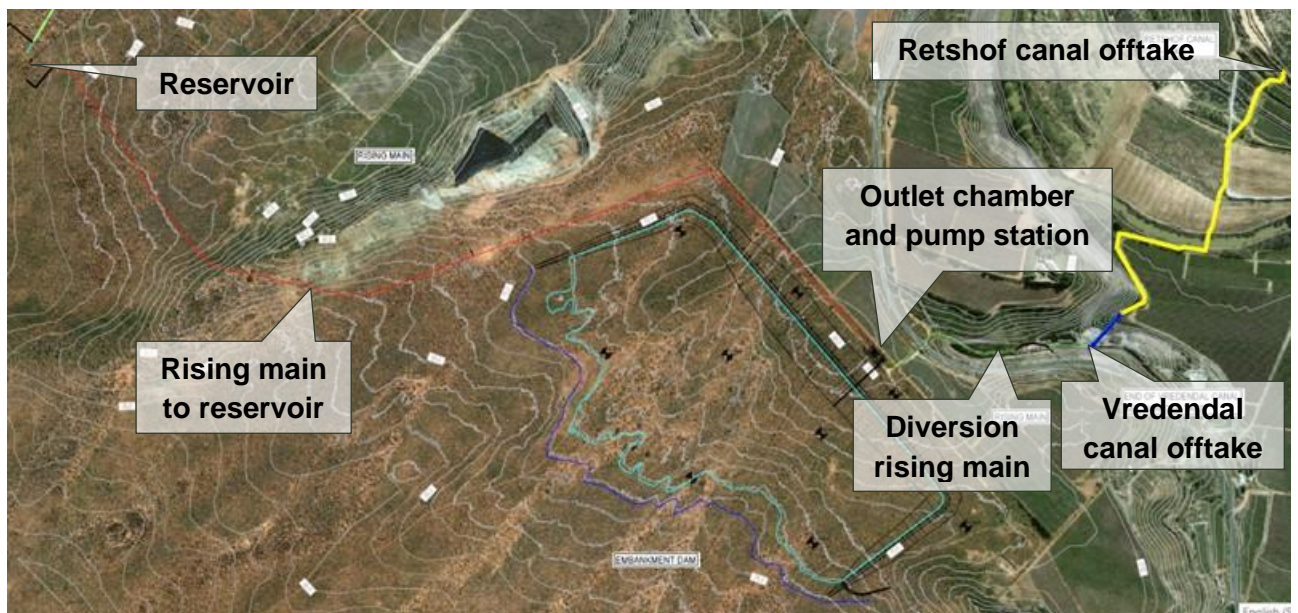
Ebenhaeser Balancing Dam and supply/connection pipe layout
